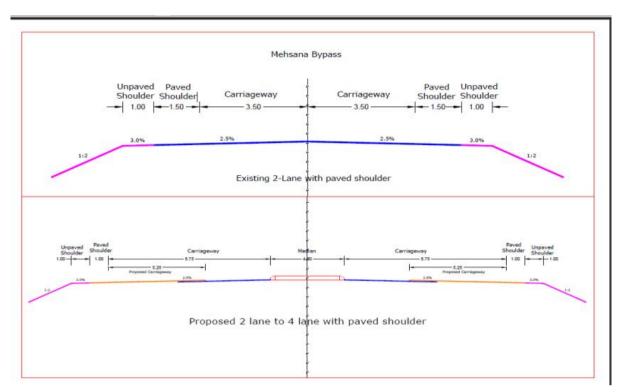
Proposed Typical cross-section for 2 Lane+PS option to 4 Lane –Mehasana Bypass (60 and 100 m RoW)
